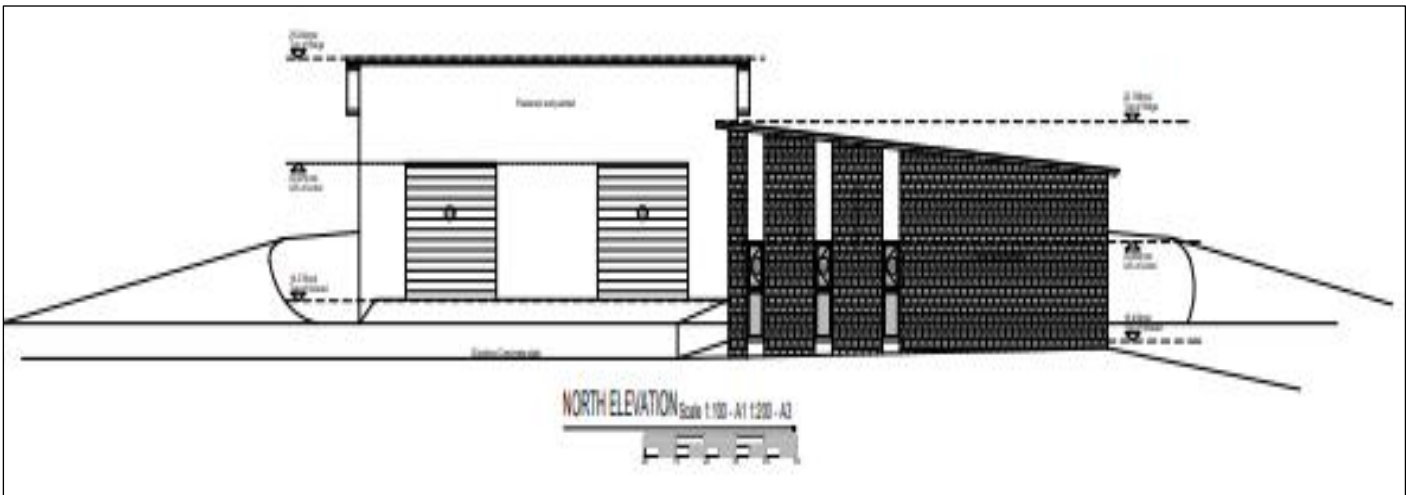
North elevation of the proposed new garages (TMBA, 2023)
